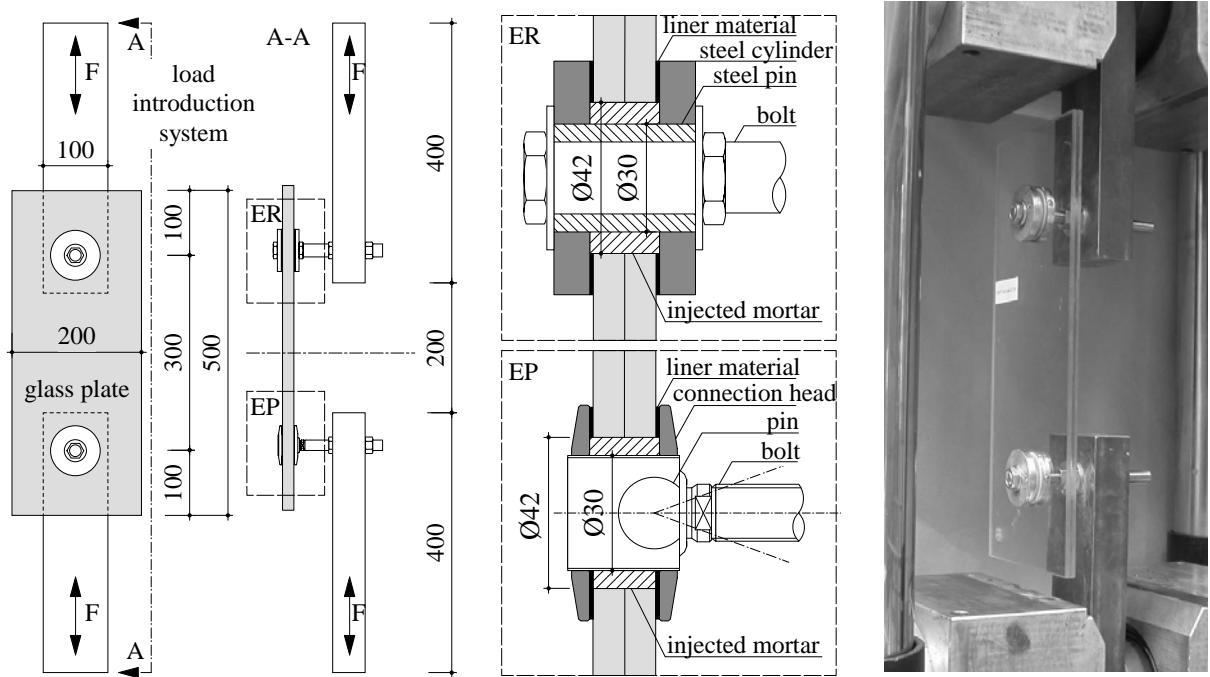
Eccentric rigid and eccentric pinned connection: plan view, side view, connection devices and specimen photo
